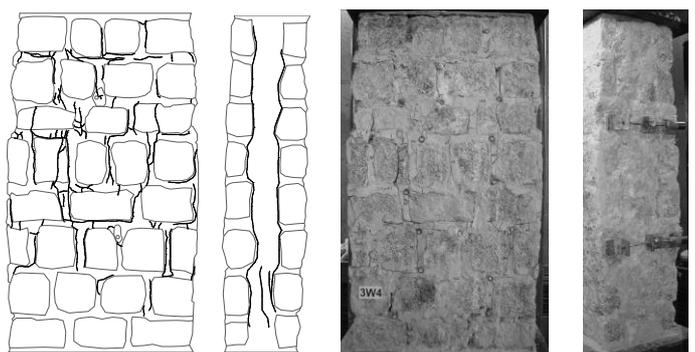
Crack pattern of wall 3W4 (combined strengthened wall).
